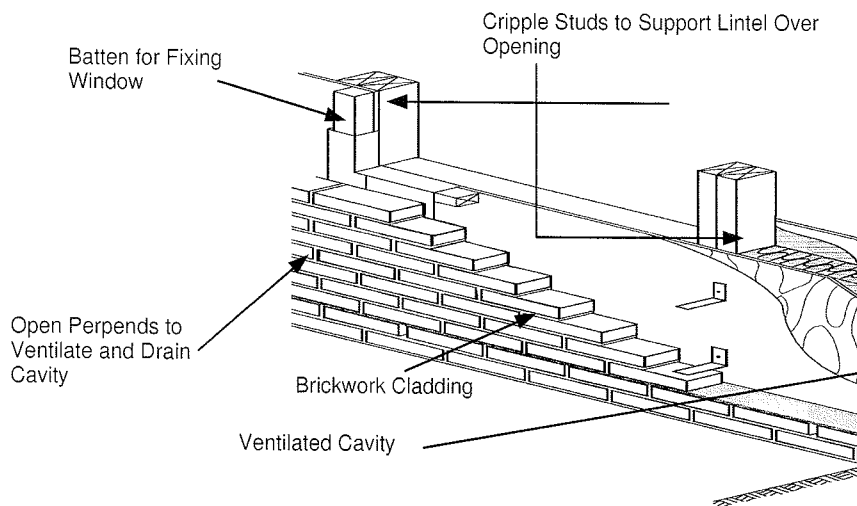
Typical Section, Brick-Clad External Timber Frame Wall
